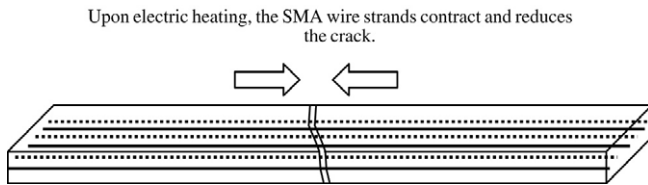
Schematic of intelligent reinforced concrete specimen.
